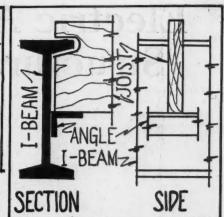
Wood Joist Resting on Steel Shelf Angle Riveted to Web of Steel Beam.
